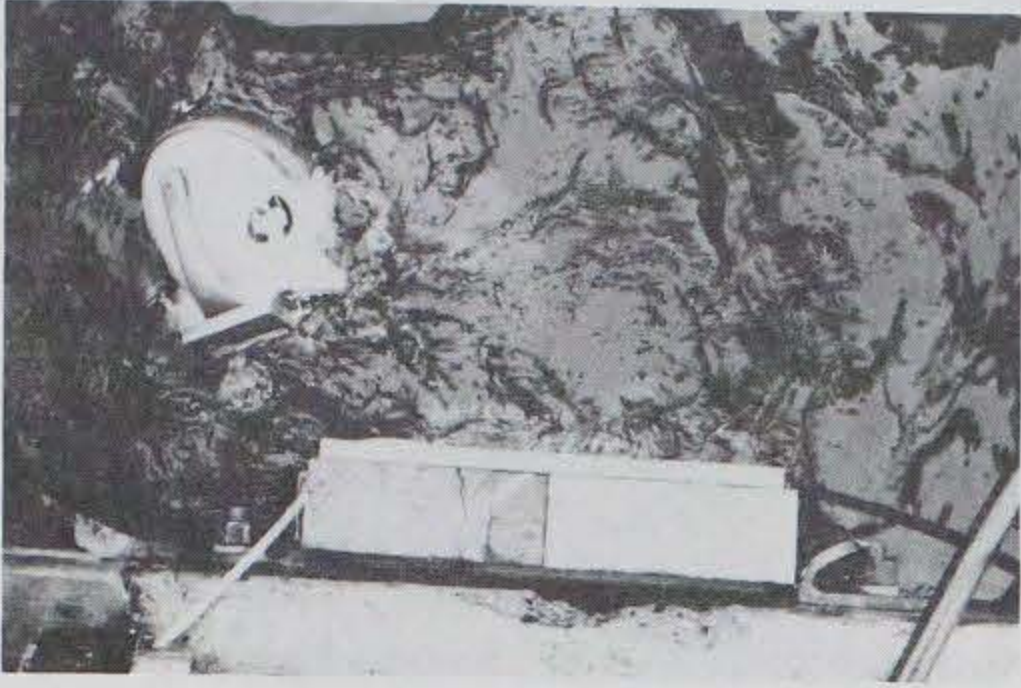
Wood bumper plate being fastened in place of a rubber fender.
